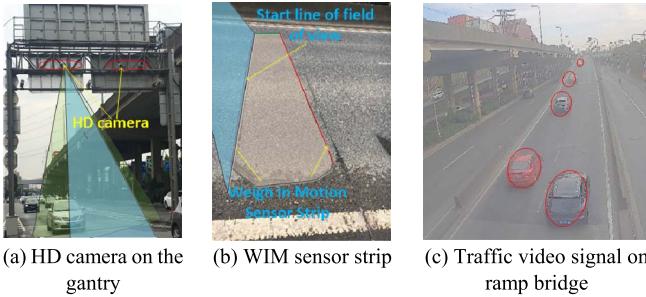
Traffic flow load monitoring system of Tongji road T4 Ramp Bridge.
